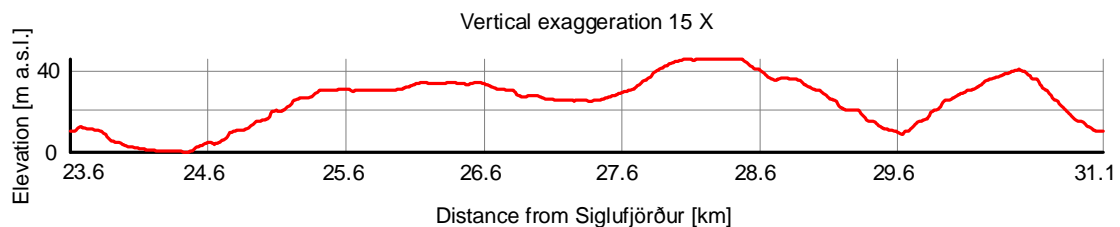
Vertical section of road section 932: km 23.6-31.1 – Ketilás to pipe 510
